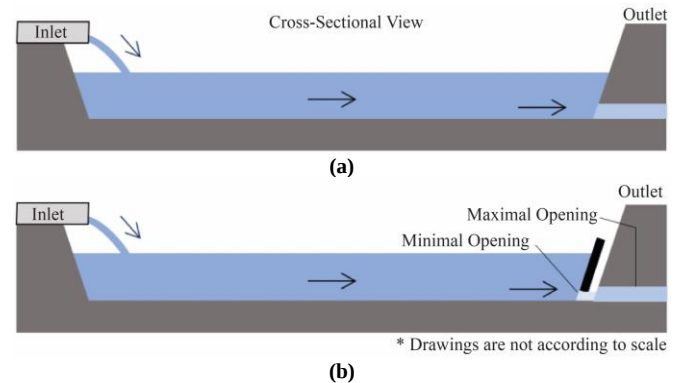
Schematic drawings of stormwater detention pond, its inlet and outlet, a) existing design and b) proposed outlet design.
